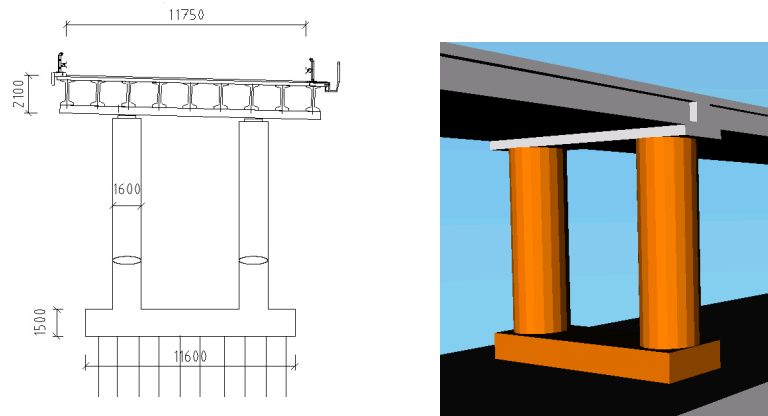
Scheme of the bridge piers and its software model in VISIPLAN 3D – alt. 1
